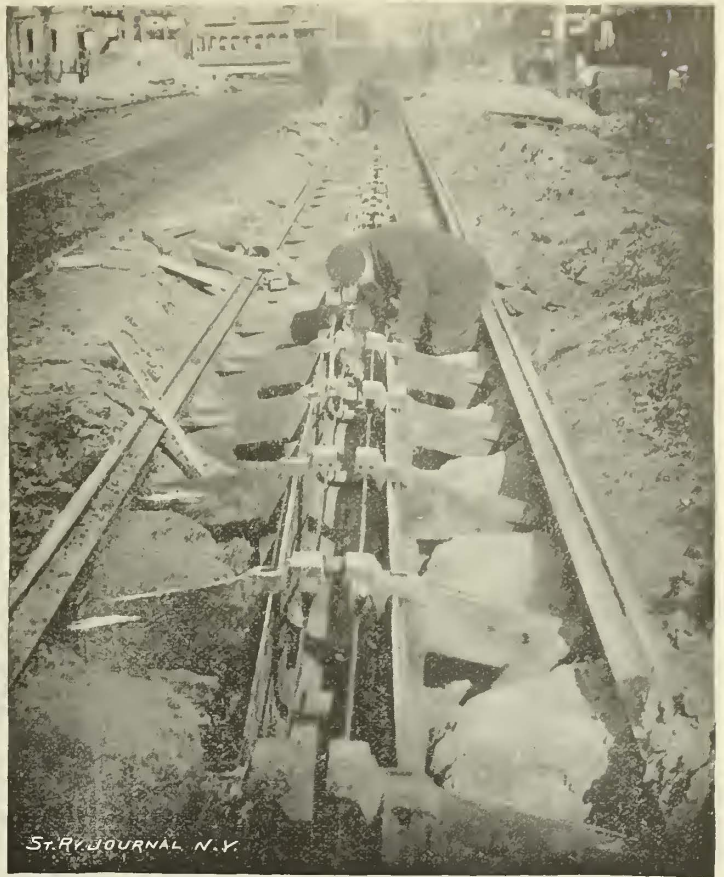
STREET SCENE—CHICAGO UNDERGROUND ELECTRIC SYSTEM.
